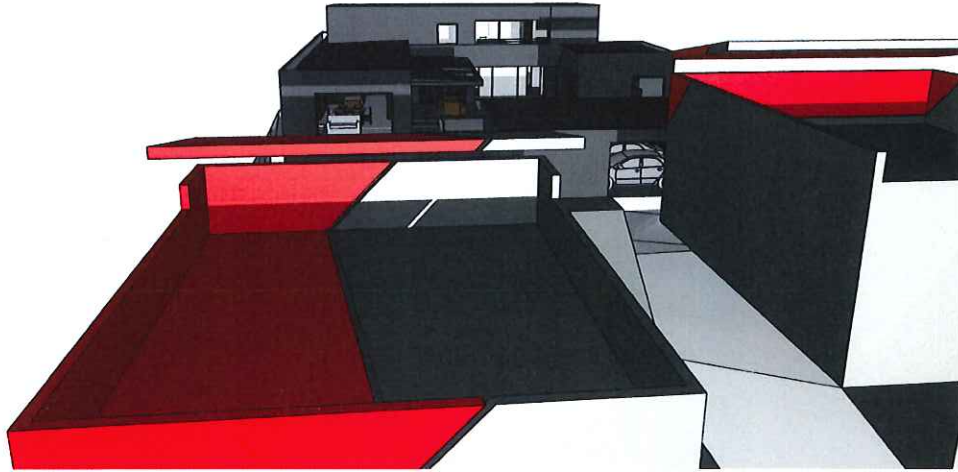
OVER SHADOWING 8AM (WITHIN BUILDING ENVELOPE)
